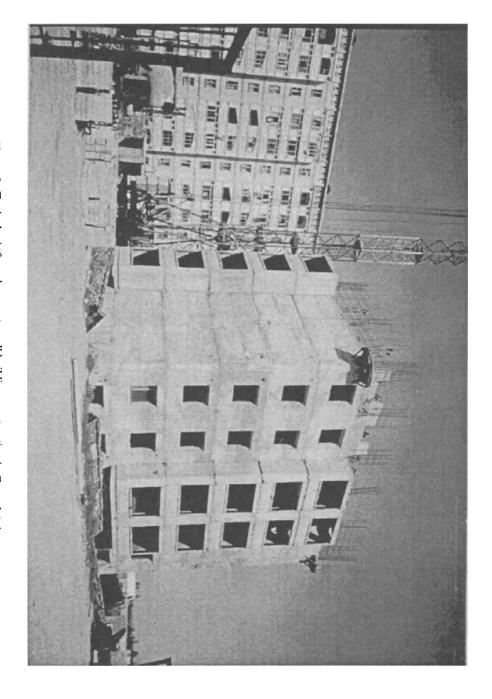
Typical reinforced concrete wall building construction in Central Asia.
